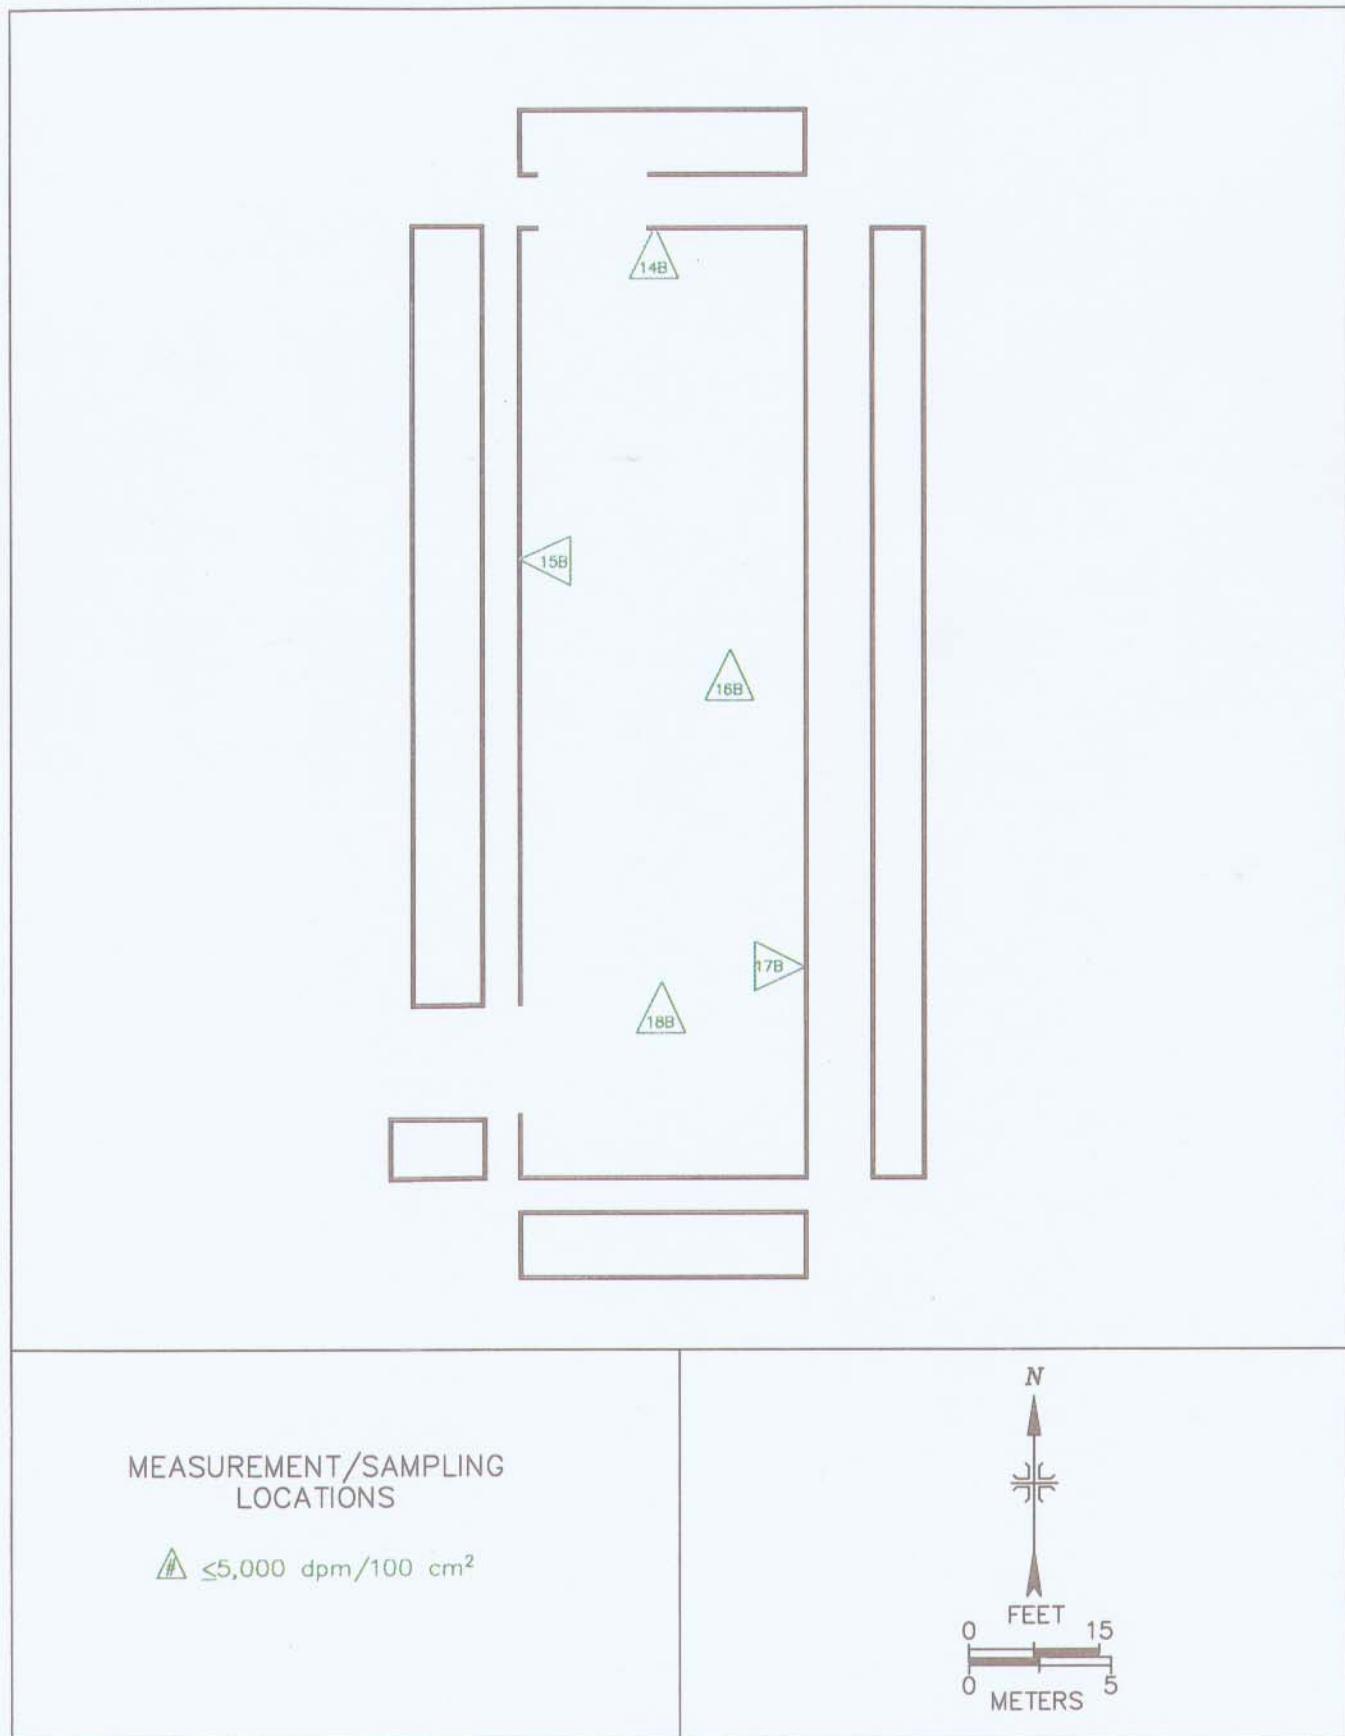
Building 35, Upper Surfaces – Direct Measurement and Sampling Locations
